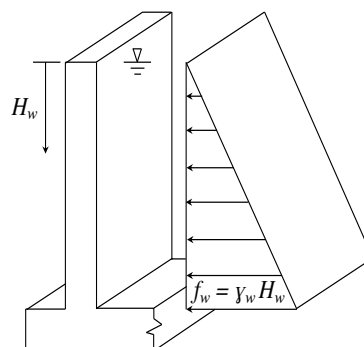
Hydrostatic water load acting on a WRS wall section.
